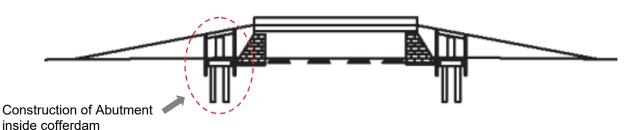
Reconstruction Procedure of Step 1 for Type-1 Bridge
